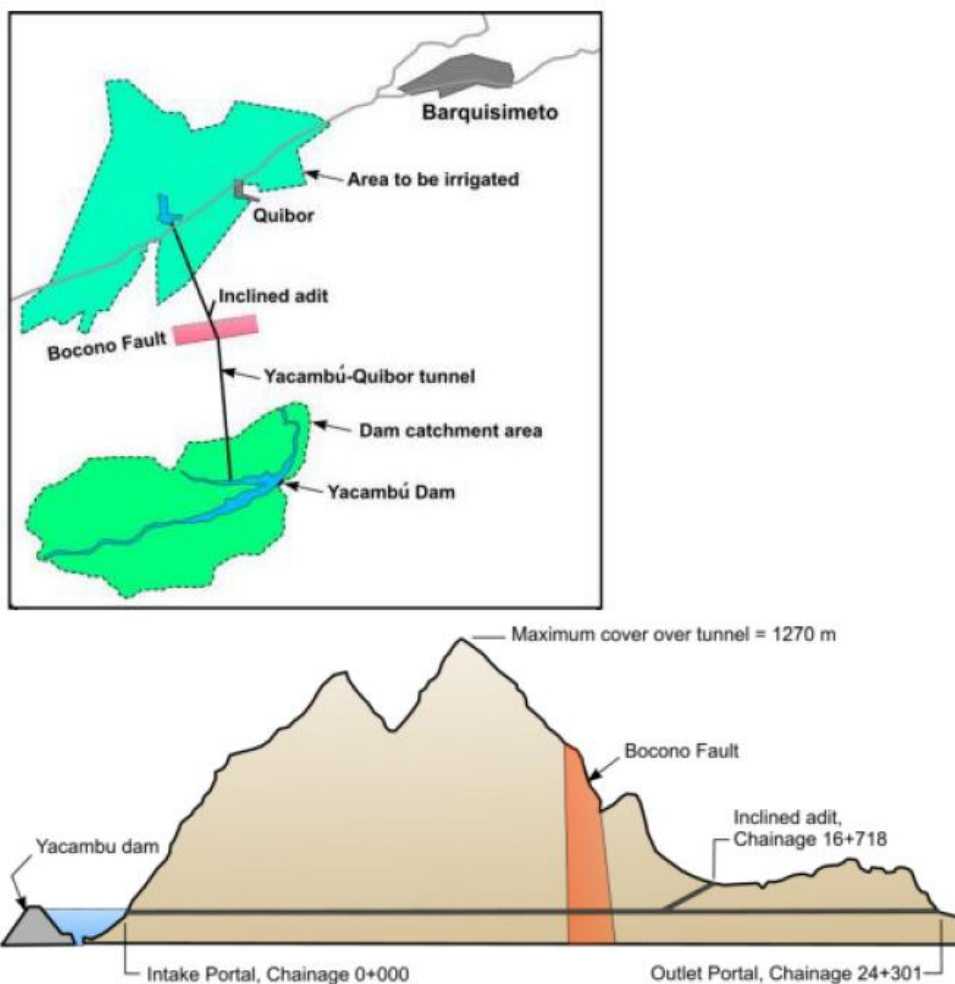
Plan and cross section along tunnel alignment of Yacambú-Quibor project, Venezuela (Hoek and Guevara, 2009a)
